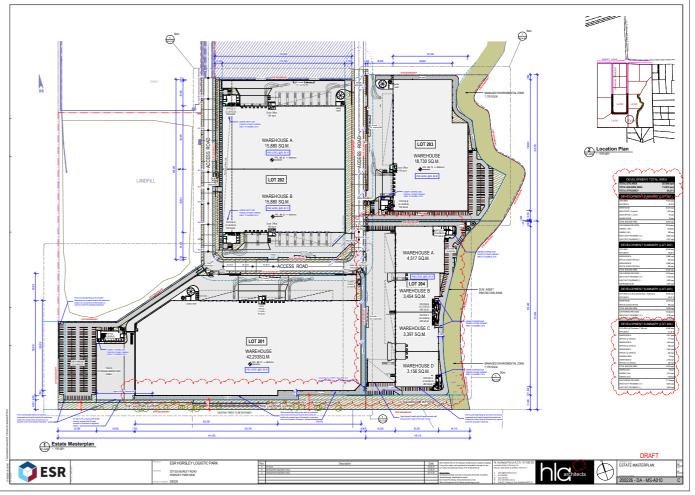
Proposed ESR Masterplan (Source: HLA Architects)
